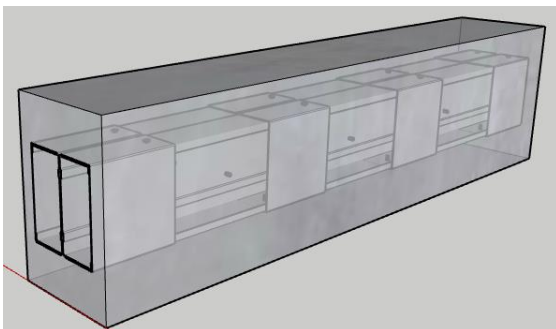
C75 Double Channel Back to Back Cold form steel Beam with stiffener
